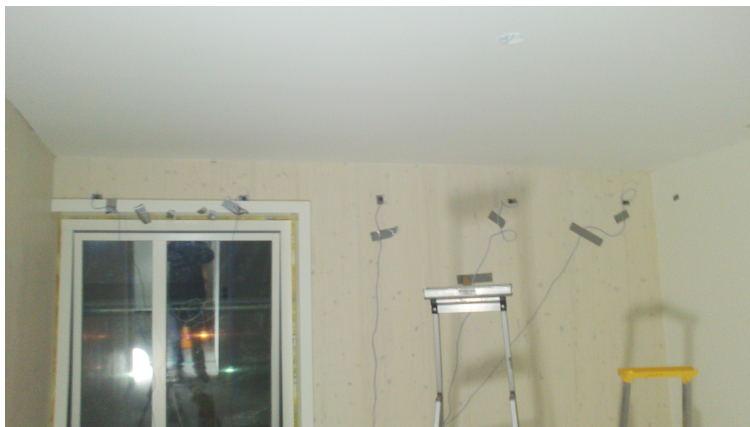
Photo of the measurement set at points 21-25 at the wall.
